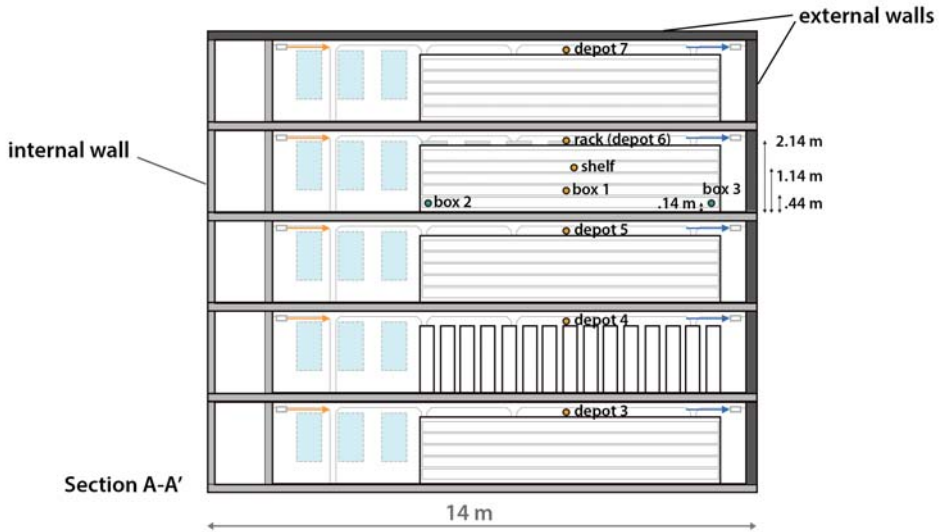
Vertical section A-A' shows a schematic of the repository tower (floors 3 to 7) with the locations of the T/RH sensors.
